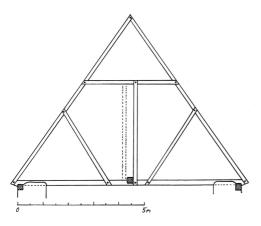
Section of the roofing above the nave in Bredestad. A collar-beam roof truss with suspended beam, which shift position from side to side of a centred steering beam. Drawing by R. Gullbrandsson.
